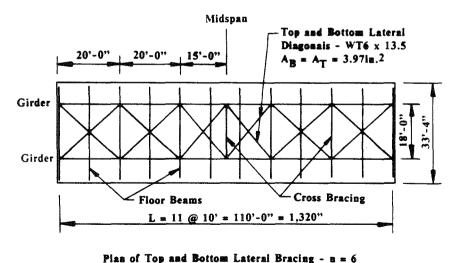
Examples C1 and C2, Ref. C-5 (A36 Steel)
